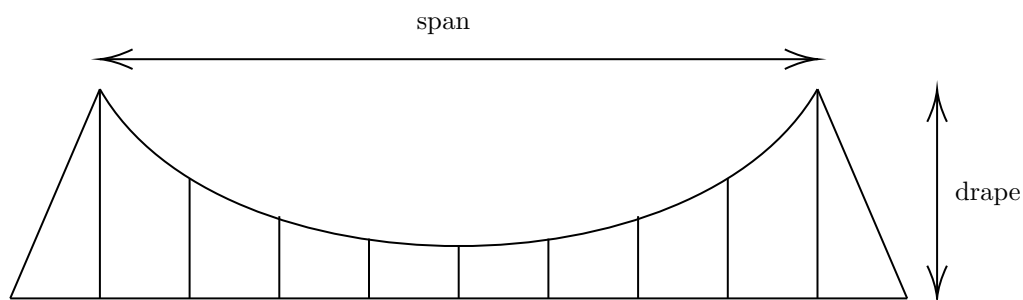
Another type of bridge is the suspension bridge. Two strong main cables run parallel to each other and are fastened to concrete pillars on either side of the bridge. Secondary vertical cables adds support to the horizontal bridge platform.
